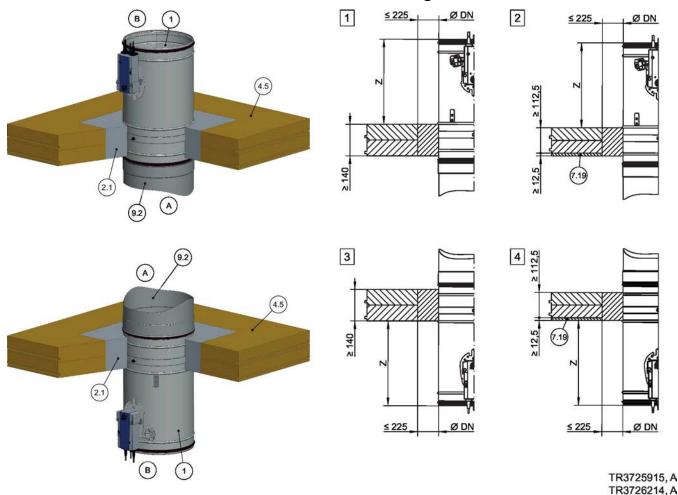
Mortar-based installation into a solid wood ceiling, suspended or upright
